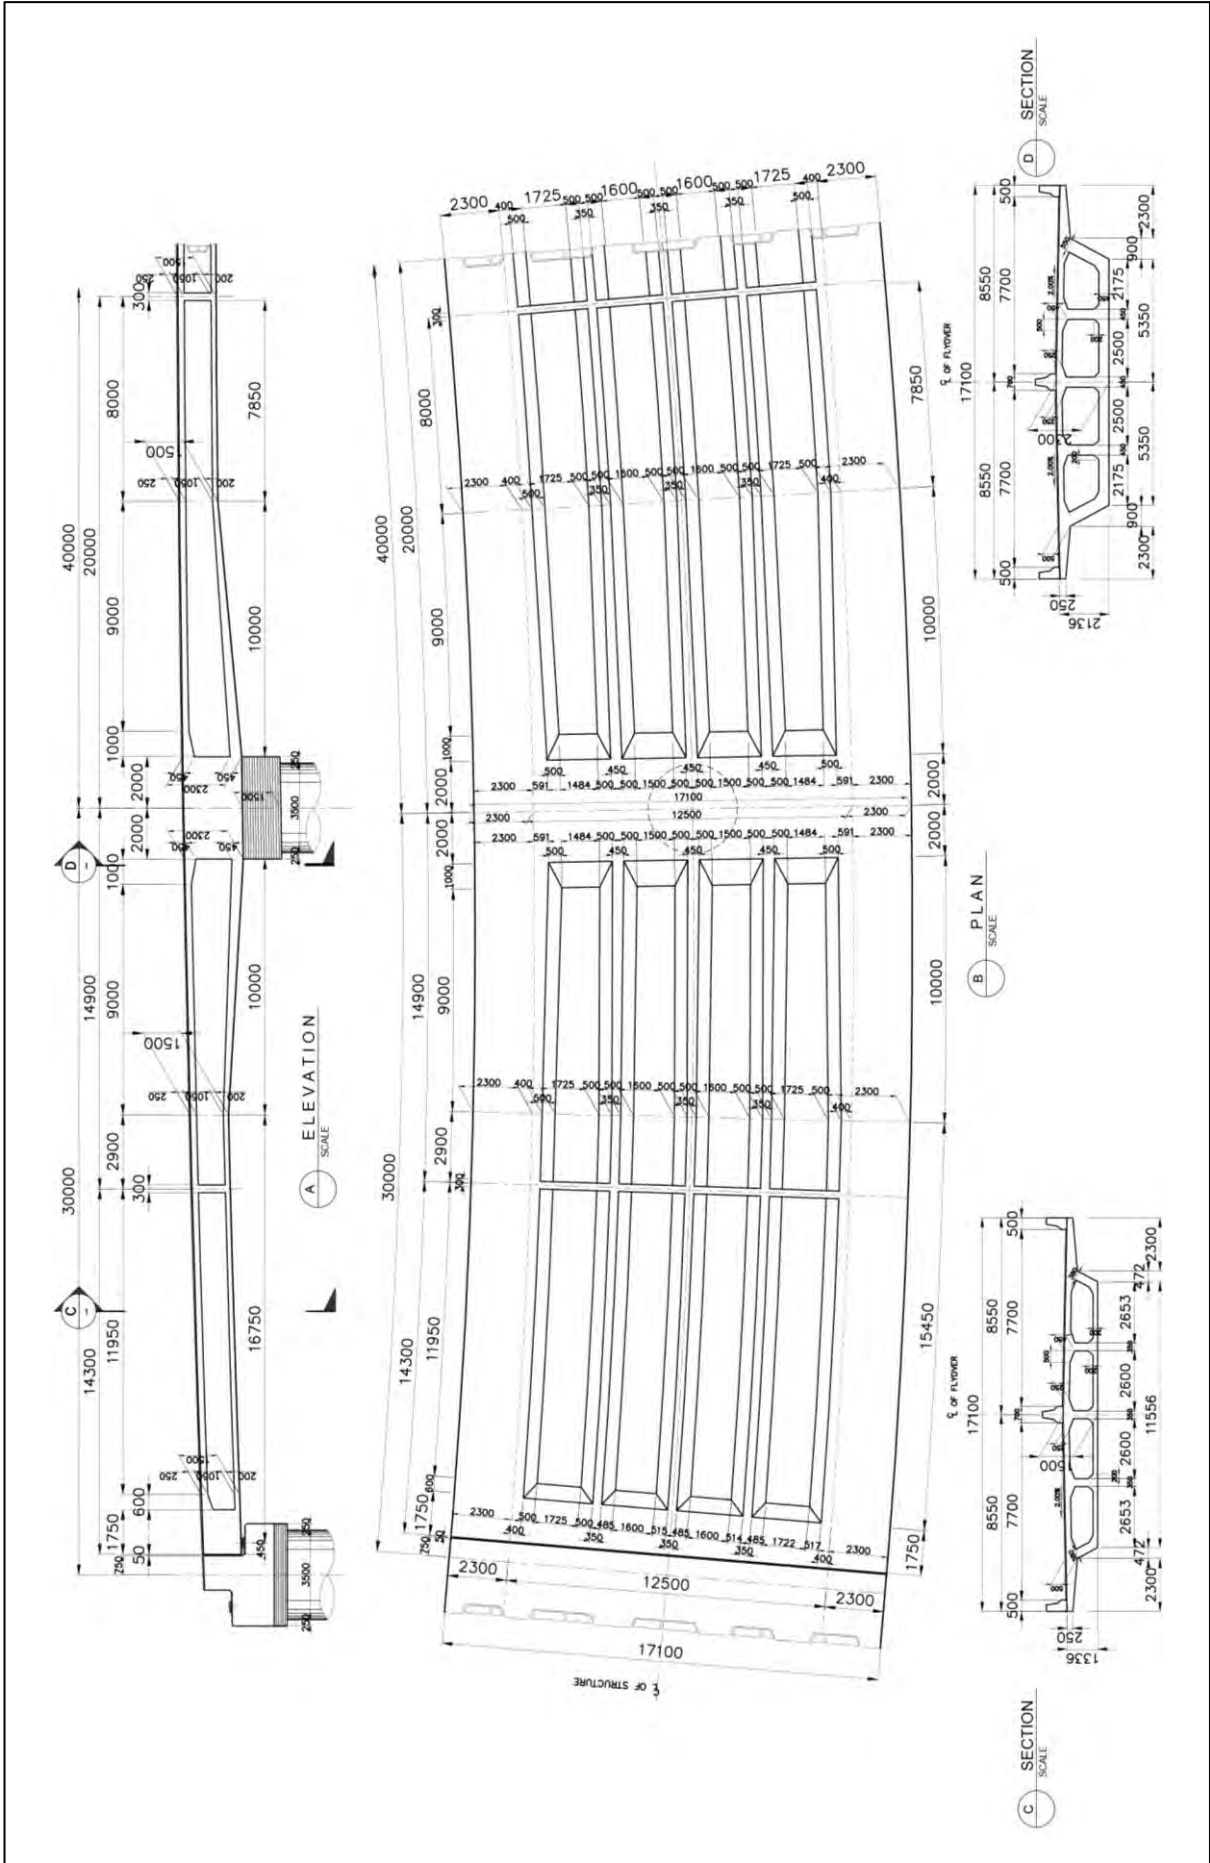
Slab Layout Plan (2/2) (C-3/E. Rodriguez Interchange)
